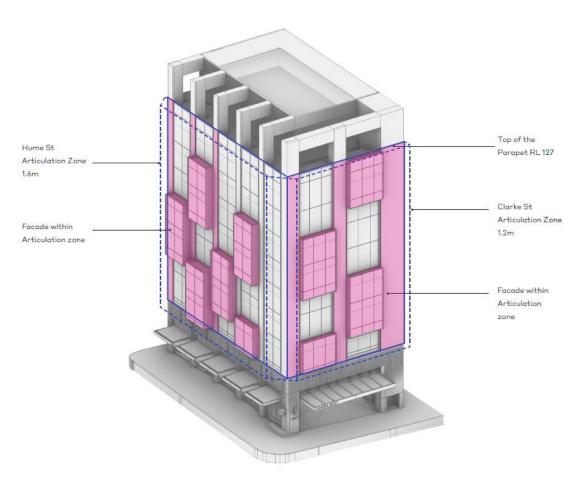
Site C OSD articulation elements located outside the building envelope but within the articulation zones (shown in pink)
